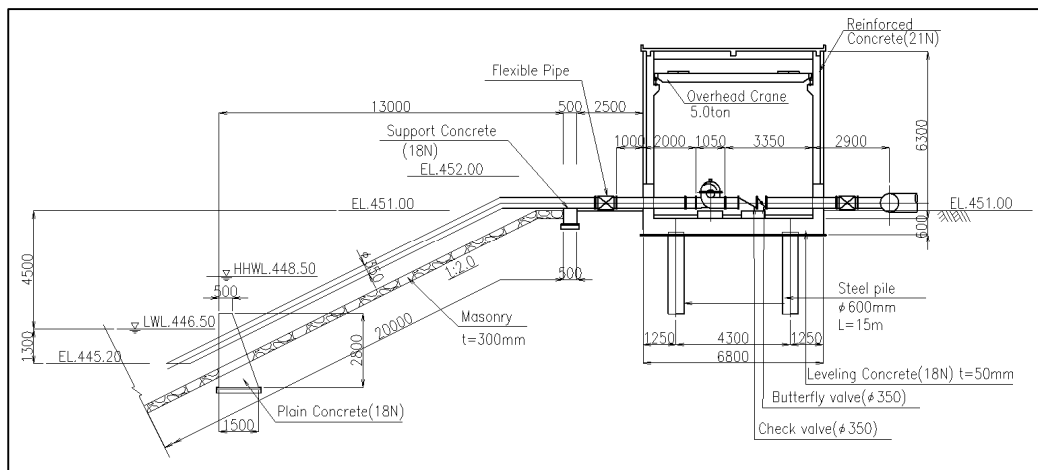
Plan and Section of Pump Station Building (Profile)
